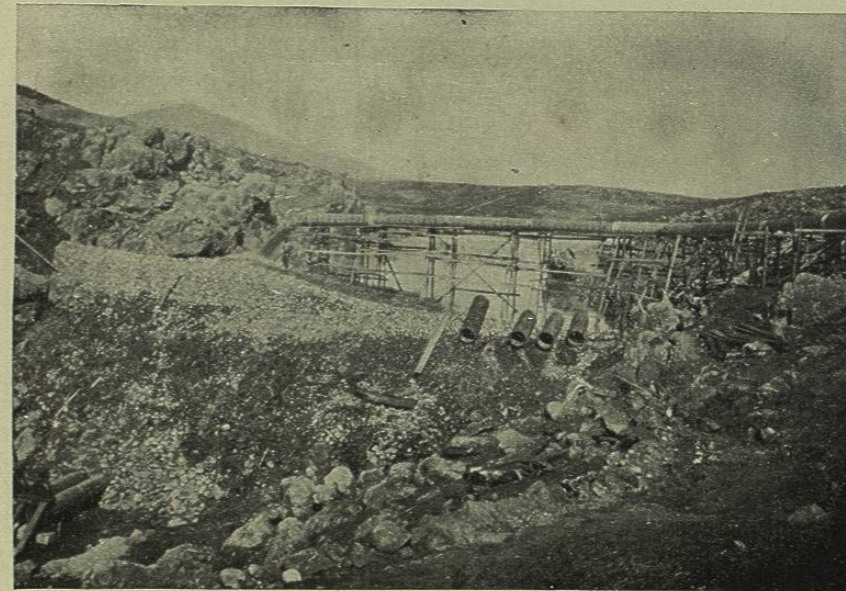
LA MESA HYDRAULIC-FILL DAM, SHOWING PIPE DISCHARGING MATERIAL ON THE DAM.
